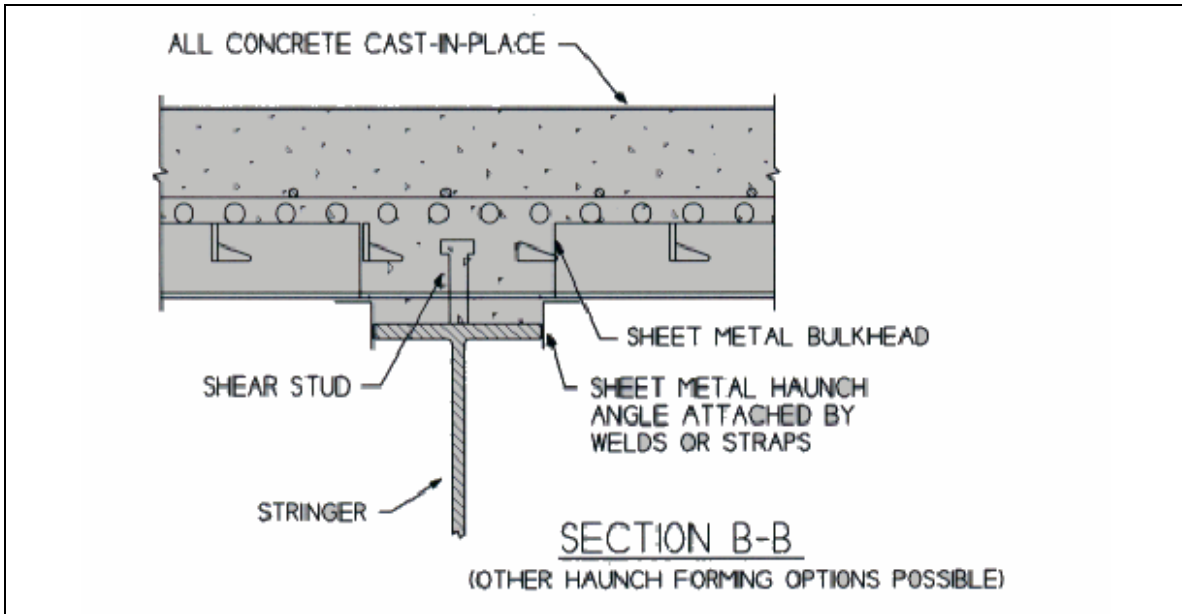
Typical girder/deck connection for cast-in-place applications (Exodermic Bridge Deck, Inc., 1998)
